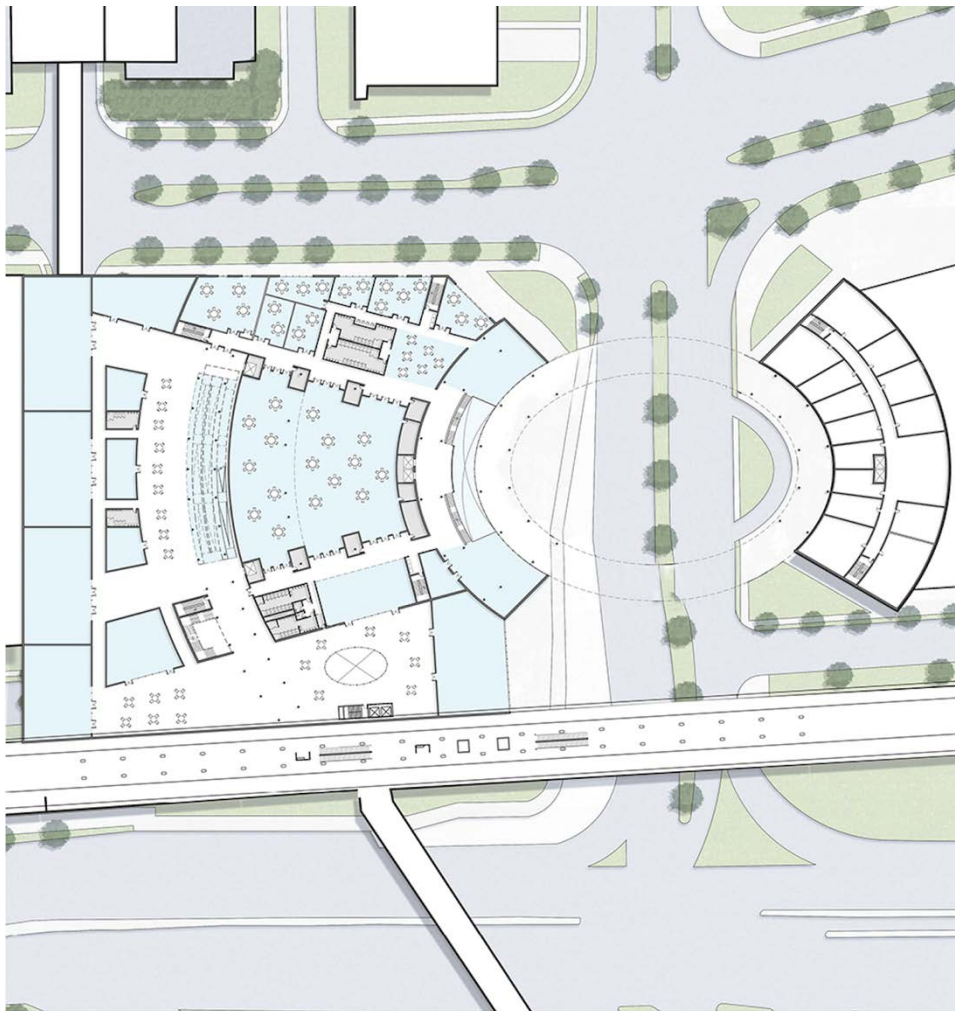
Second Floor Plan – Digital Hall & Metro Boarding Level (Source: Jefferson Choi)
